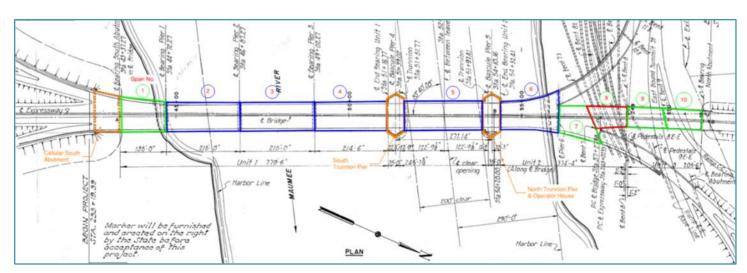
General Plan of Bridge, inspection plan color-coded for span type and access
